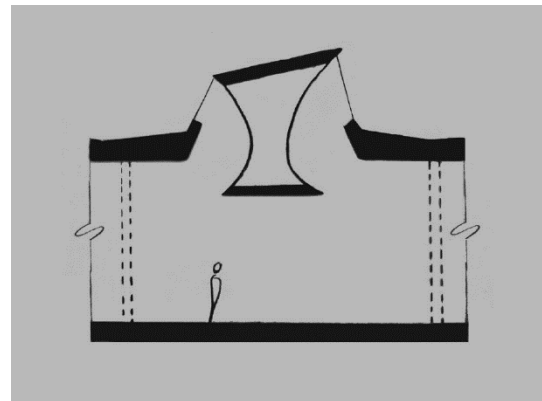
section with the roof light openings (Storey-Fleming, 2014)
